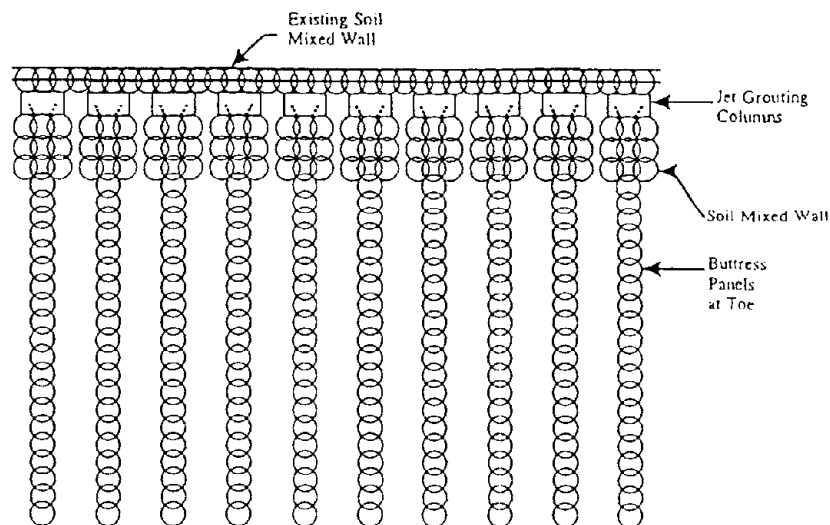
Soil mixed wall buttress for toe installation during excavation.
